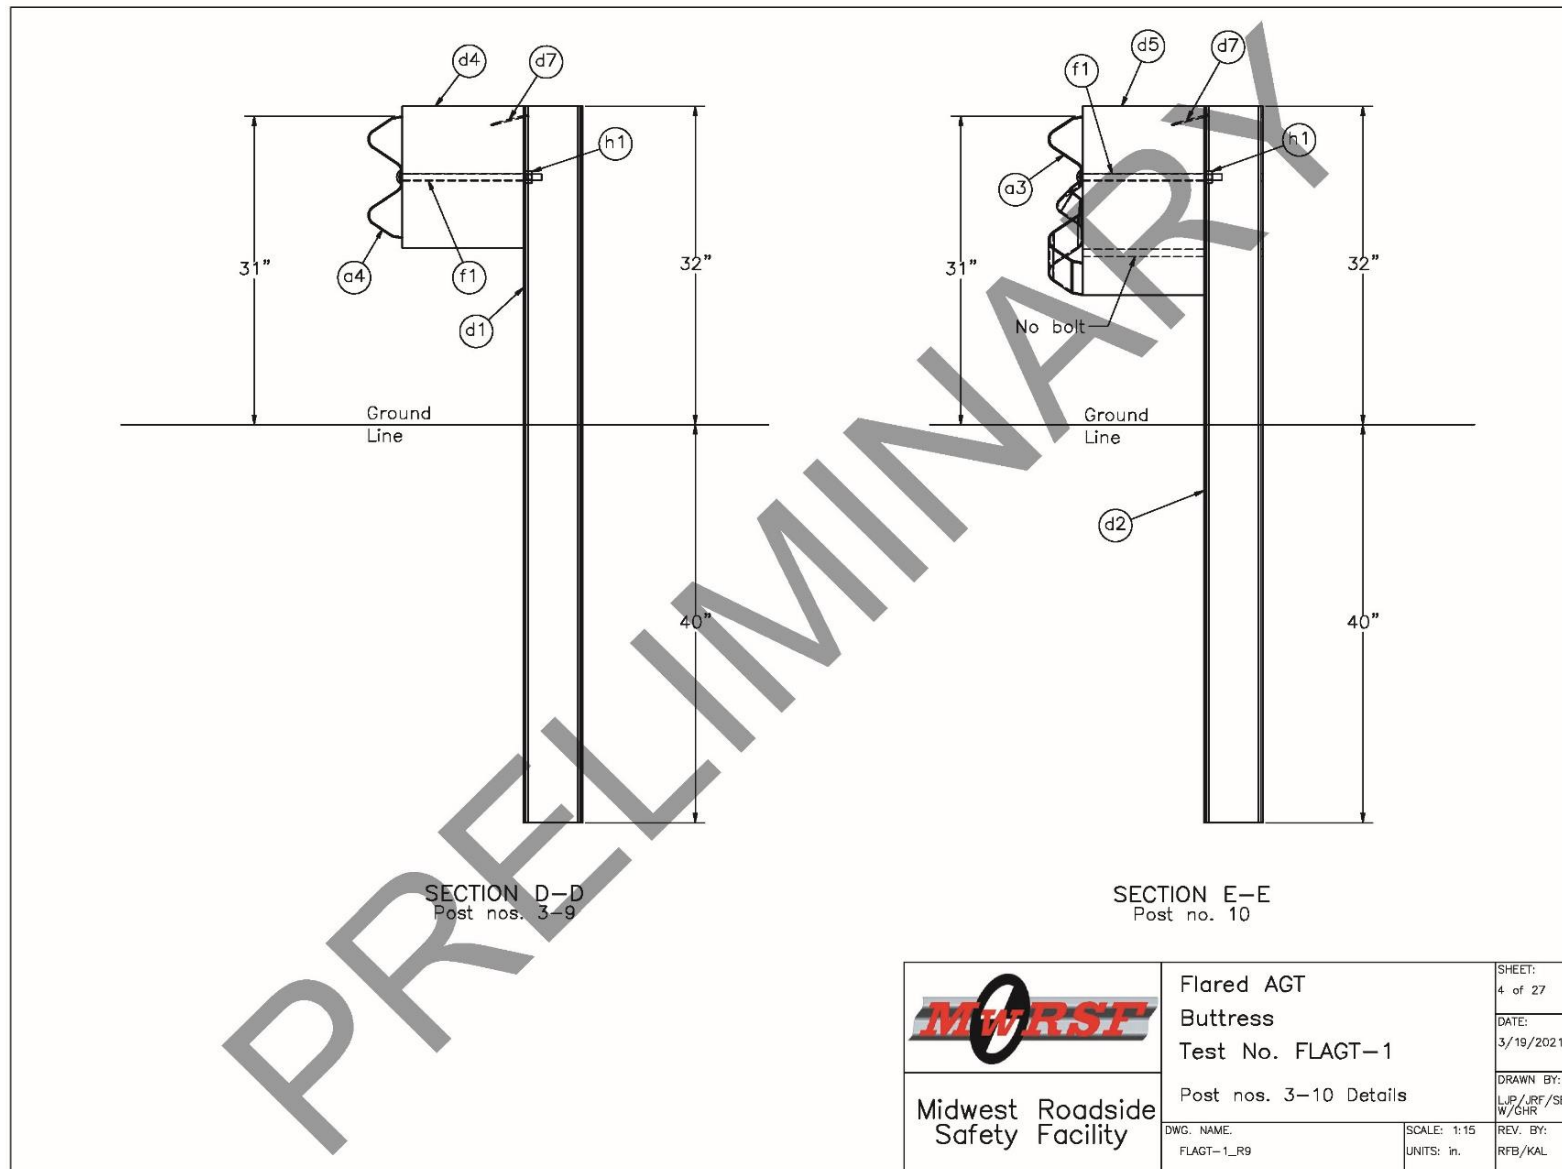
Post Nos. 3-10 Details, Test No. FLAGT-1
